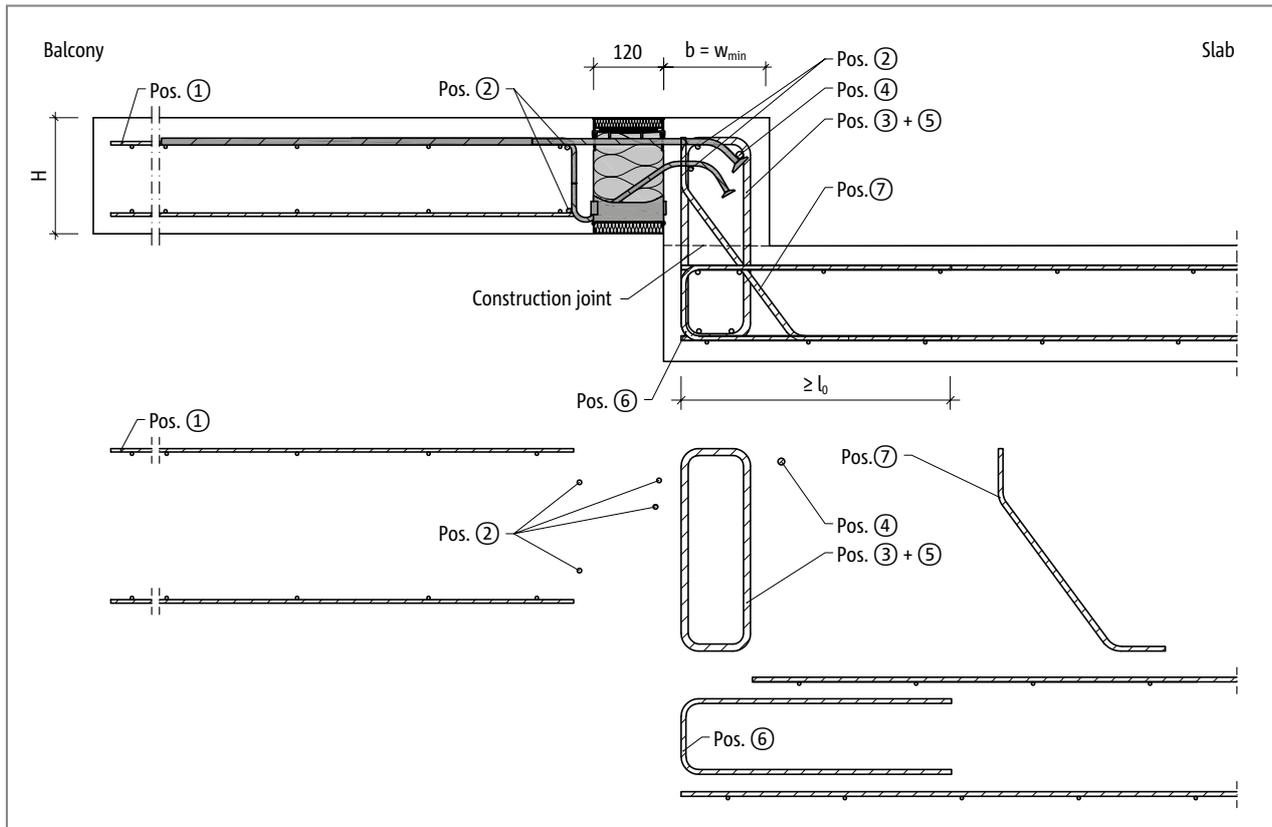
Schöck Isokorb® XT type K-O: On-site reinforcement for balcony with height offset upwards with minimum structural element dimension ($w_{vorh} = w_{min}$)
